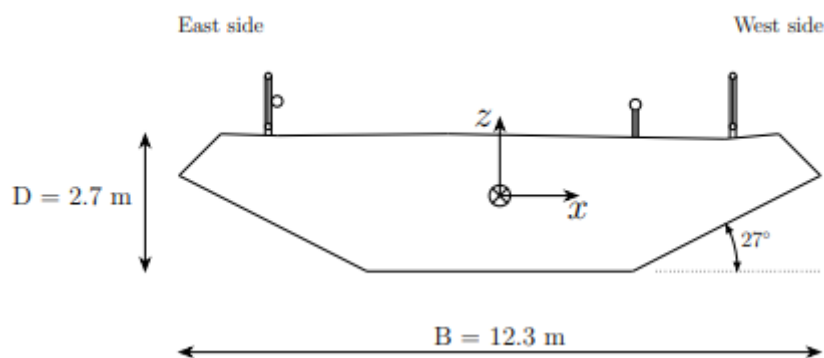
Schematic of the closed trapezoidal deck girder of Lysefjord Bridge [26]
